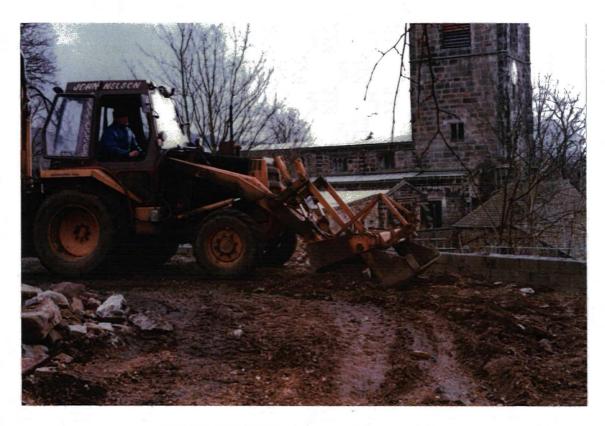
ST. JOHN'S TERRACE, GROUND LEVELLING
